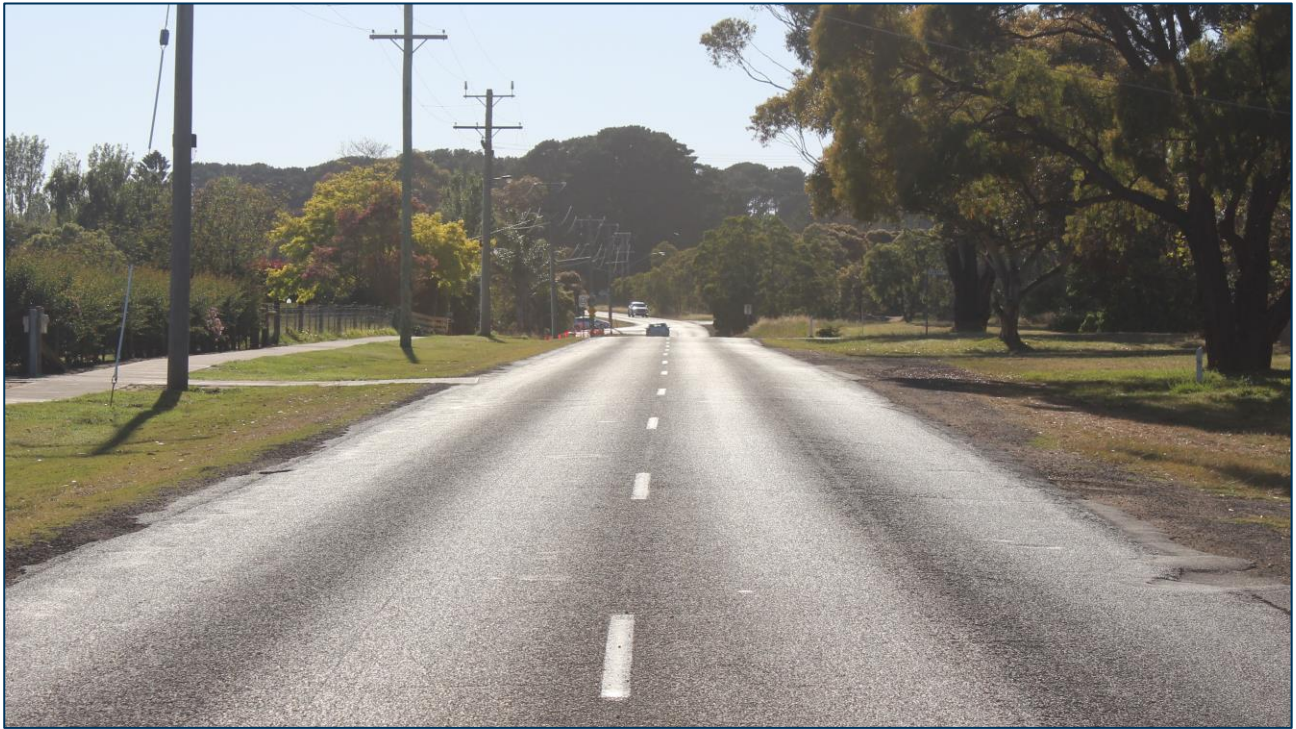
Wyndham Street, looking west adjacent to subject site
